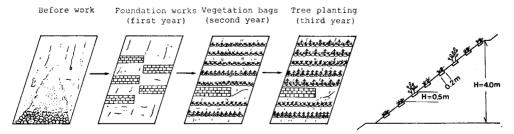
Plain figures (left) and a cross-section of the revegetation system developed for application in heavily damaged parts of Ashio mountains.
